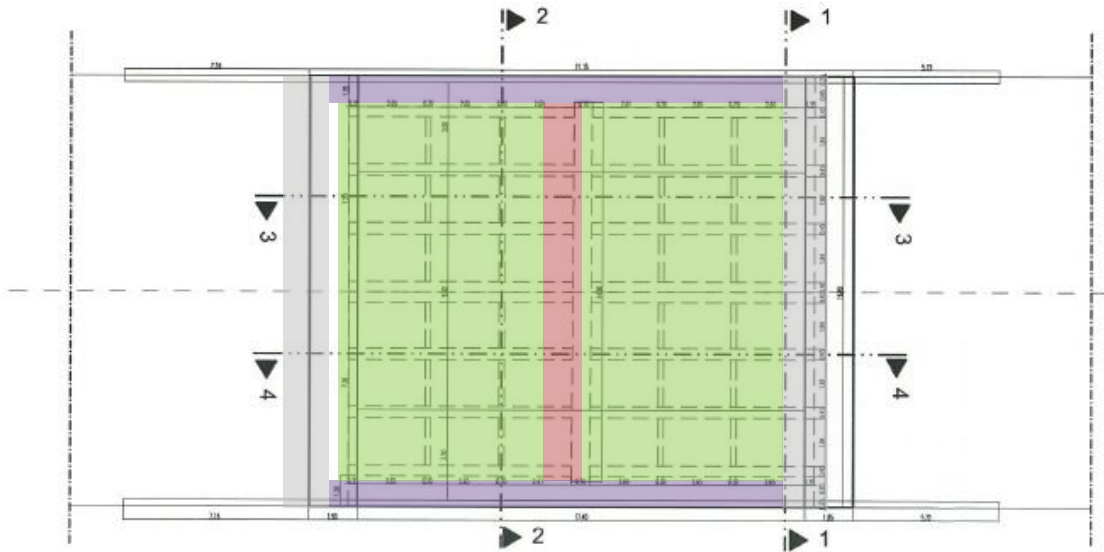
Disposition of deck slabs (green), cantilever side slabs (yellow), interior walls (grey) and exterior walls (brawn) in plane of the bridge (bottom and plan side)
